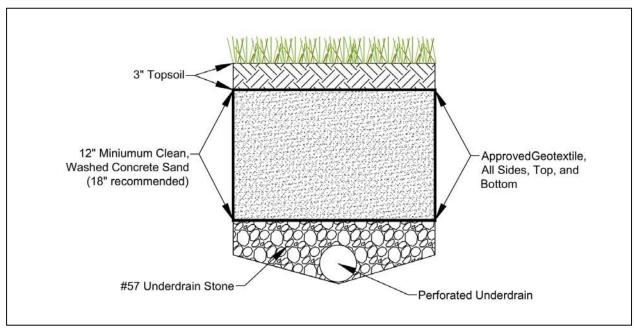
Typical schematic for a nonstructural or surface sand filter (note: material specifications are found in Table 4.44).
